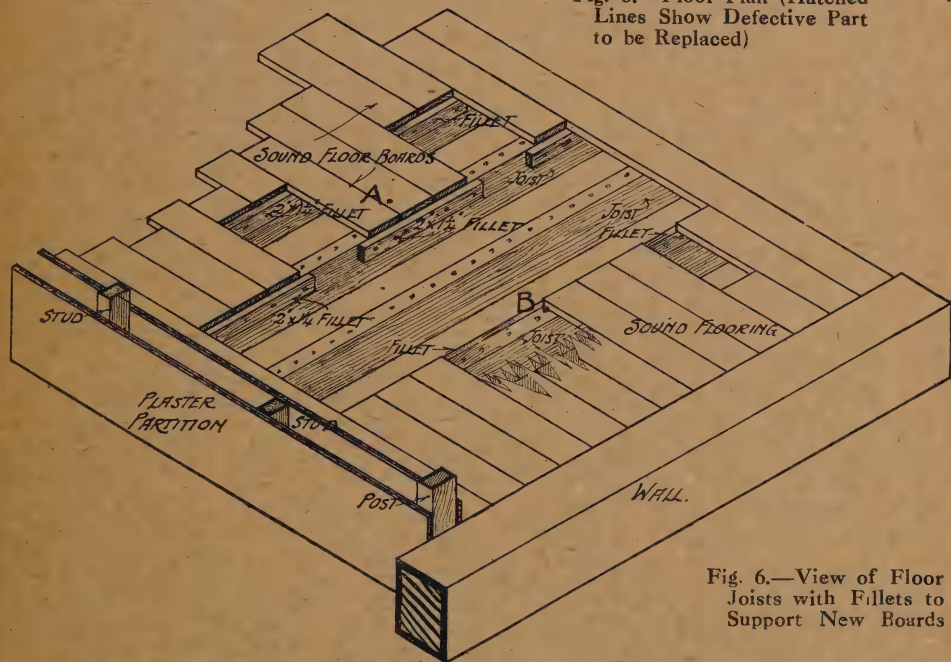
View of Floor Joists with Fillets to Support New Boards
